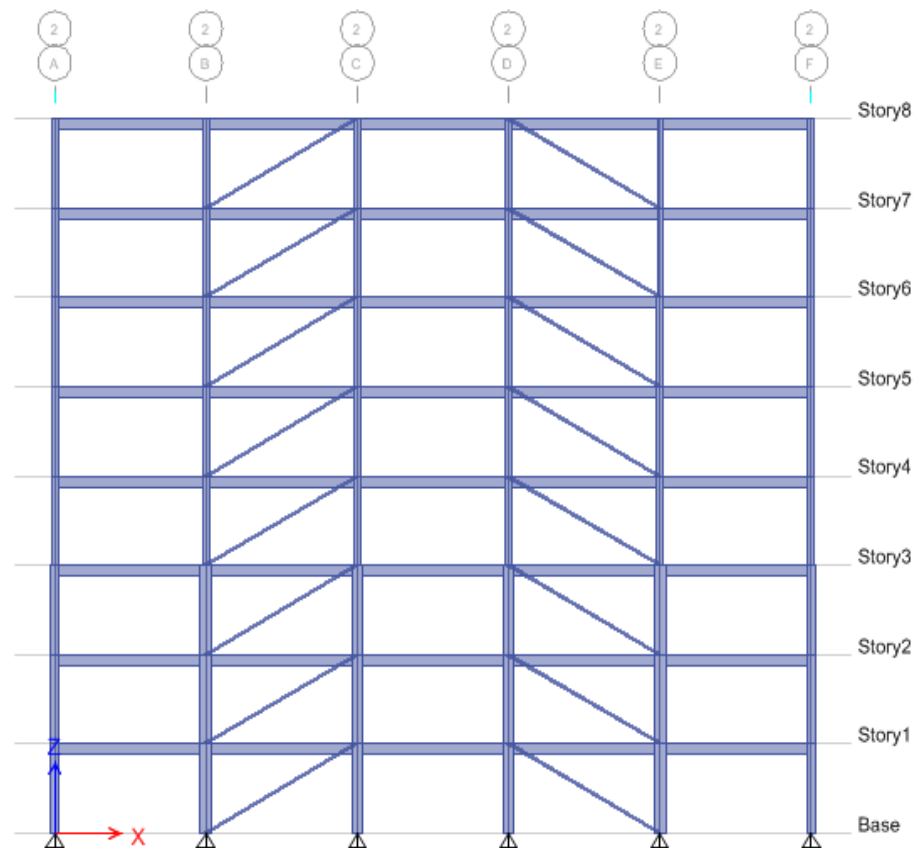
Typical truss-beam and bracing elevation of the dormitory building (IR4F-T) in x-direction.
